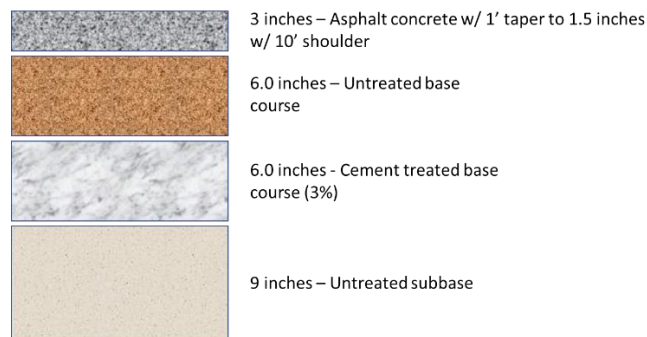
Section B inverted pavement design from I-010-1(8) [Johnson 1961].
